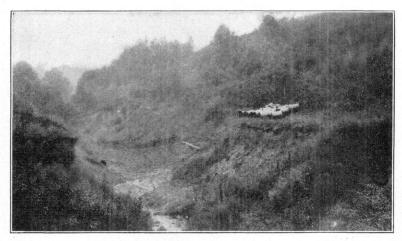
Upper side of dam in gulley just made to cause filling of gulley. The tile through the dam will be extended upward as the gulley fills.
